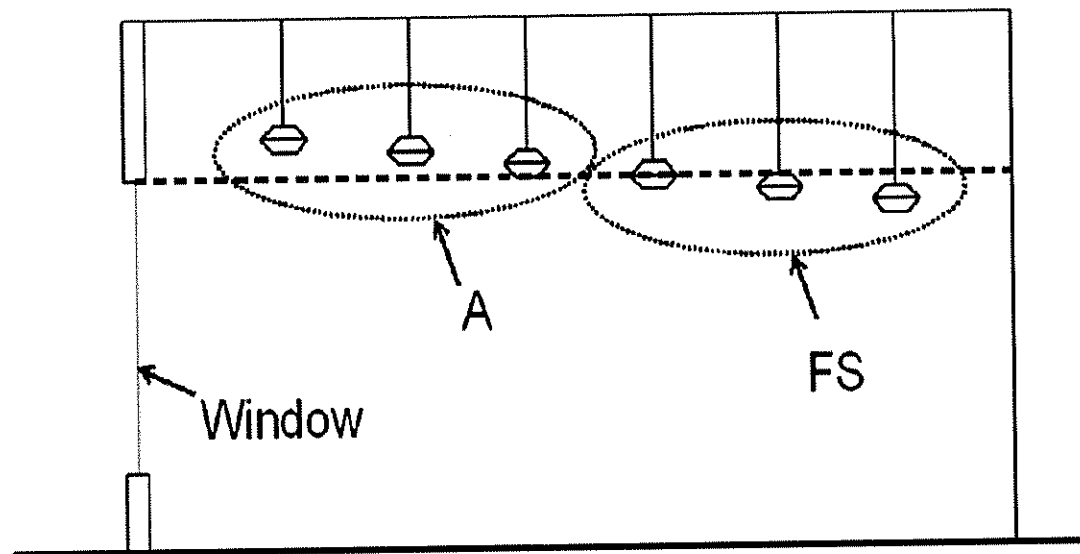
Figure A: Elevation view showing a nonresidential application of indoor lighting, labeled FS, that constitutes outdoor lighting for purposes of this article and indoor lighting, labeled A, which is installed so that it does not constitute outdoor lighting for purposes of this article.
